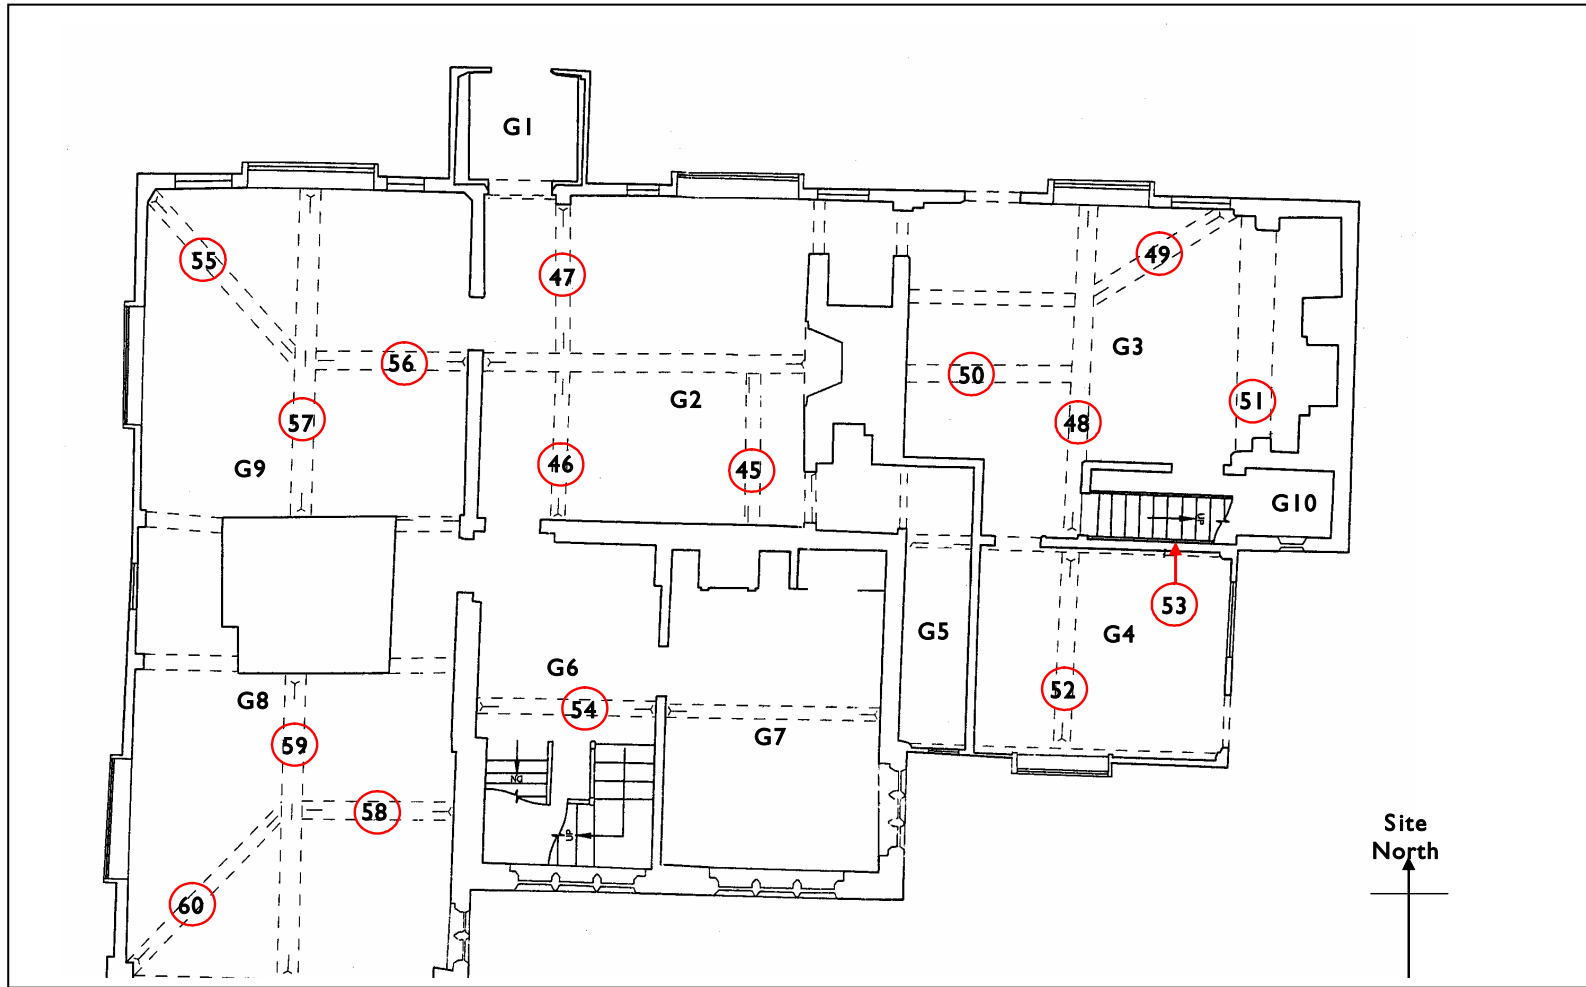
Ground-floor plan to show position of sampled timbers (after Birmingham Archaeology)
